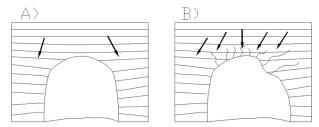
Scheme of the excavation deformation: A the excavation is in natural equilibrium, pressure is transferred to the walls of the excavation; B -wedges fall out of the excavation roof, lateral pressure prevails
